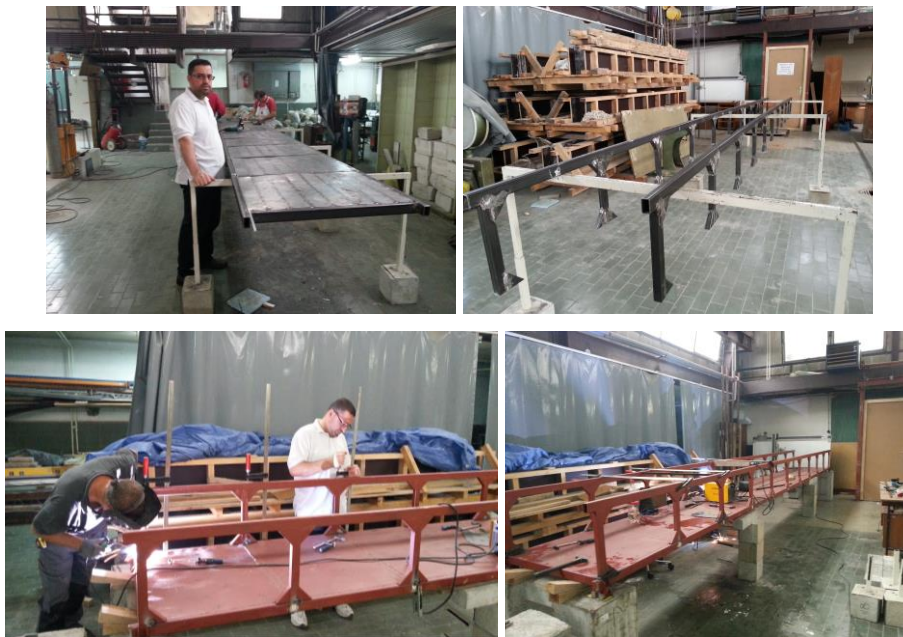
The Vierendeel bridge structural model during the erection stages
